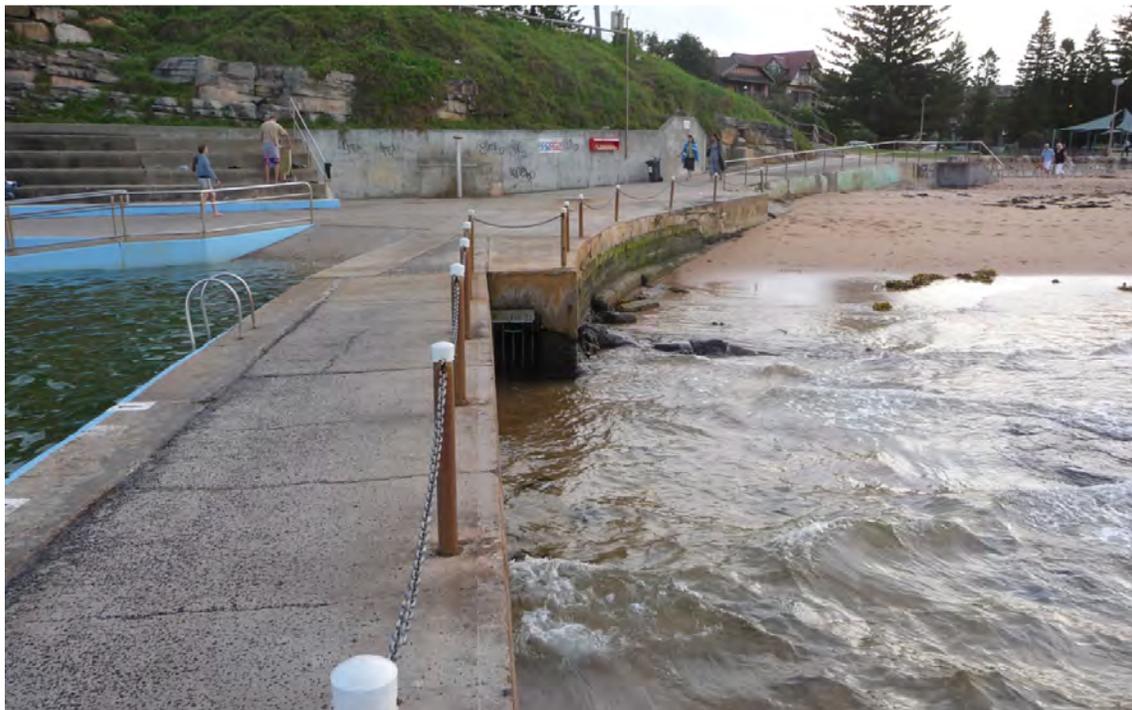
Collaroy Street stormwater outfall at Collaroy Beach, 10 June 2007
